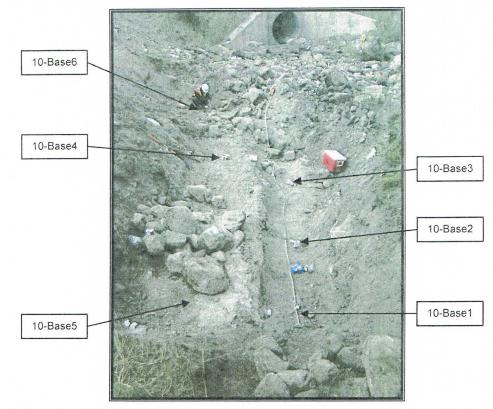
Removal of boulder and rock erosion control prior to remedial excavation (9 Sept 2010).
